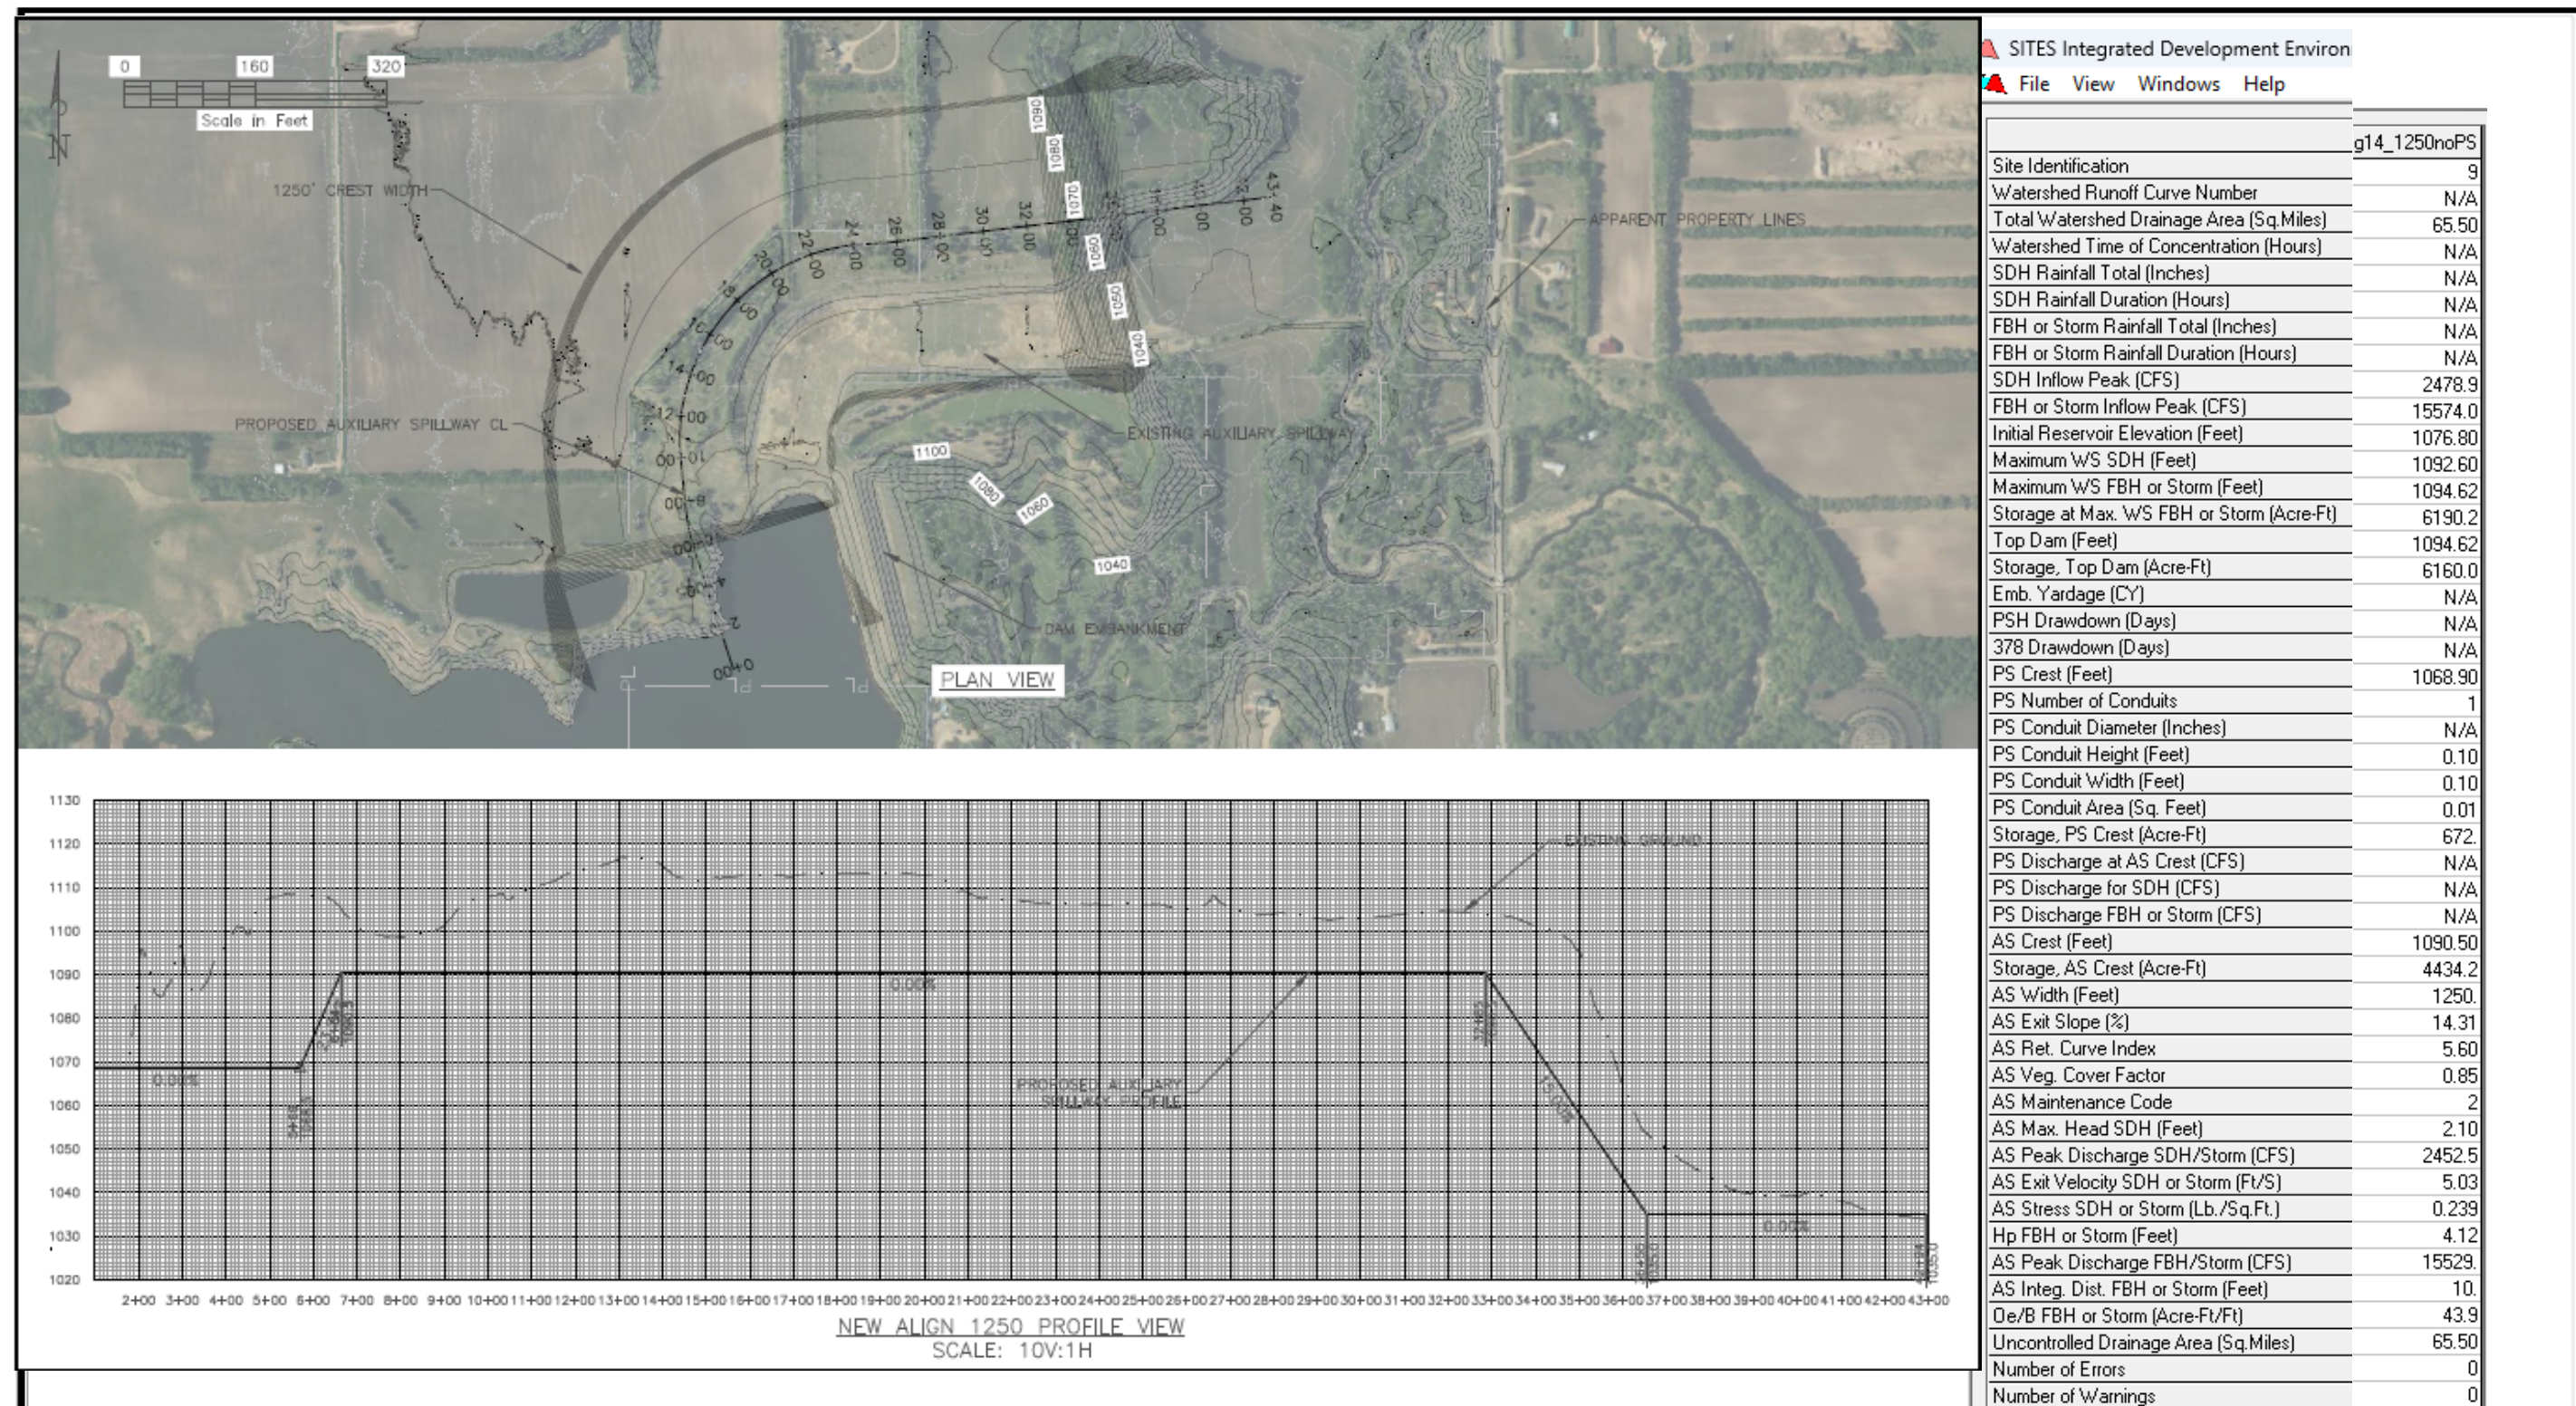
Alternative 1: Earthen Spillway Conceptual Plan and Profile – 1,250 feet Wide SITES Model Results, Conceptual Design Plan & Profile
